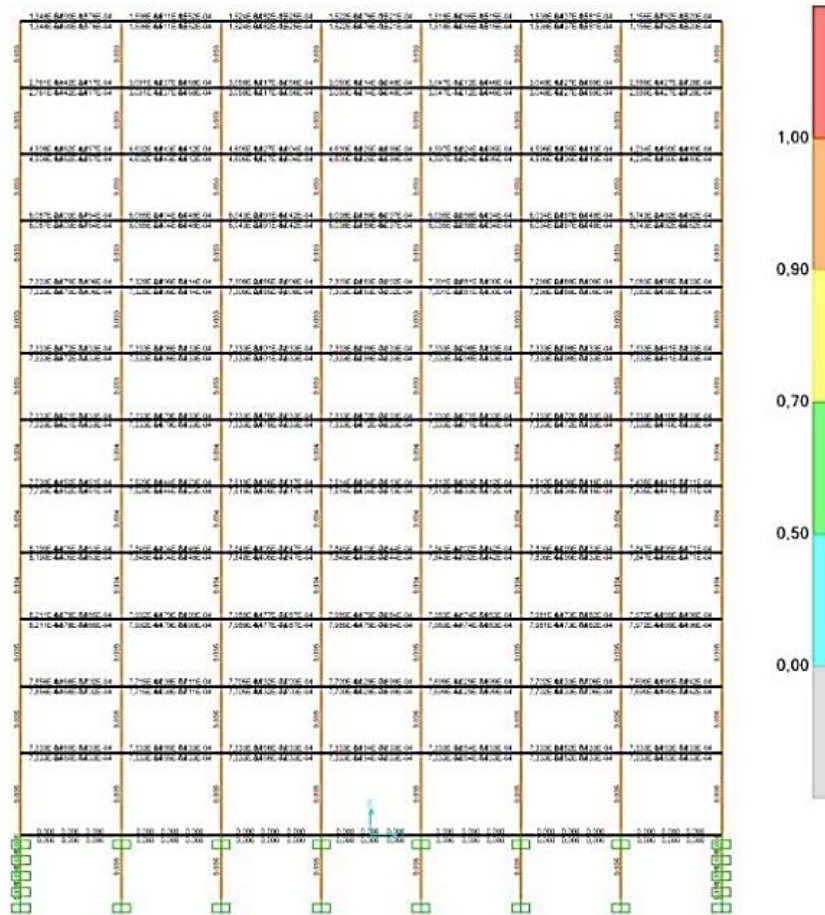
Stability check of the reinforcement design for the short span.
